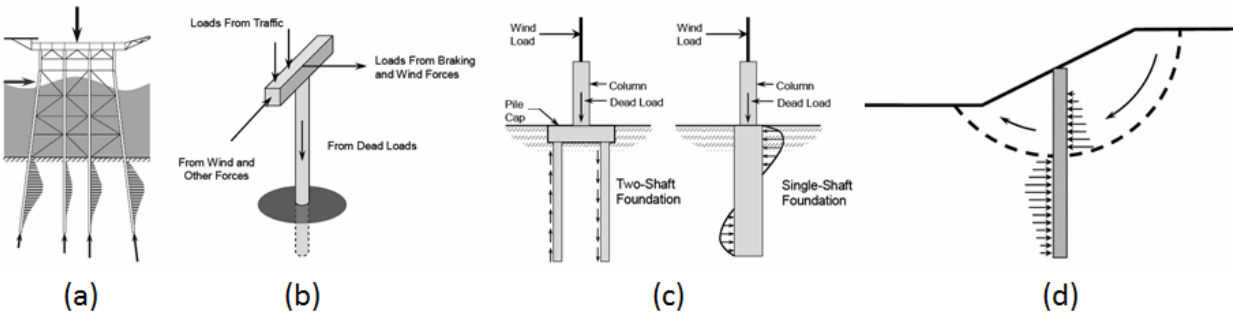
Deep foundations applications: (a) Offshore applications, (b) Single pile support for a bridge, (c) Pile supported overhead sign, (d) Piles to stabilize slopes. Source: Reese et al. [91].
